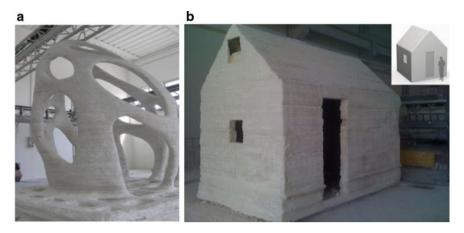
a Radiolaria Pavilion, b Ferreri house printed by D-shape [20]
